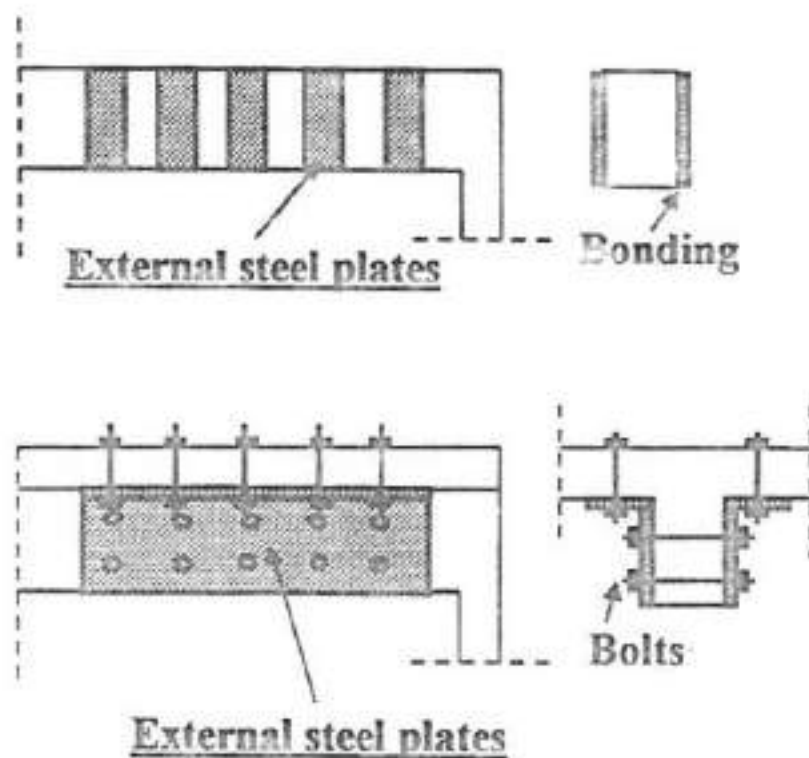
Addition of external steel plates (Source: Ziara, 2014).
